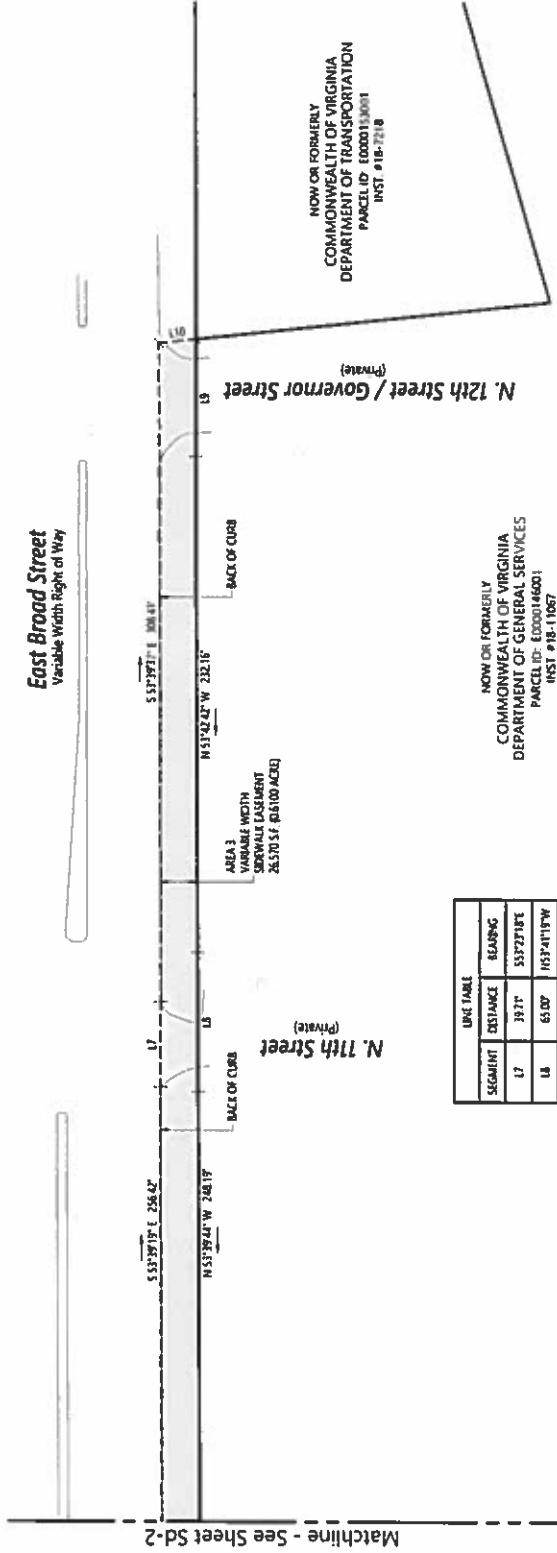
# EXHIBIT B (SIDEWALK EASEMENT Pg. 3 OF 3)
